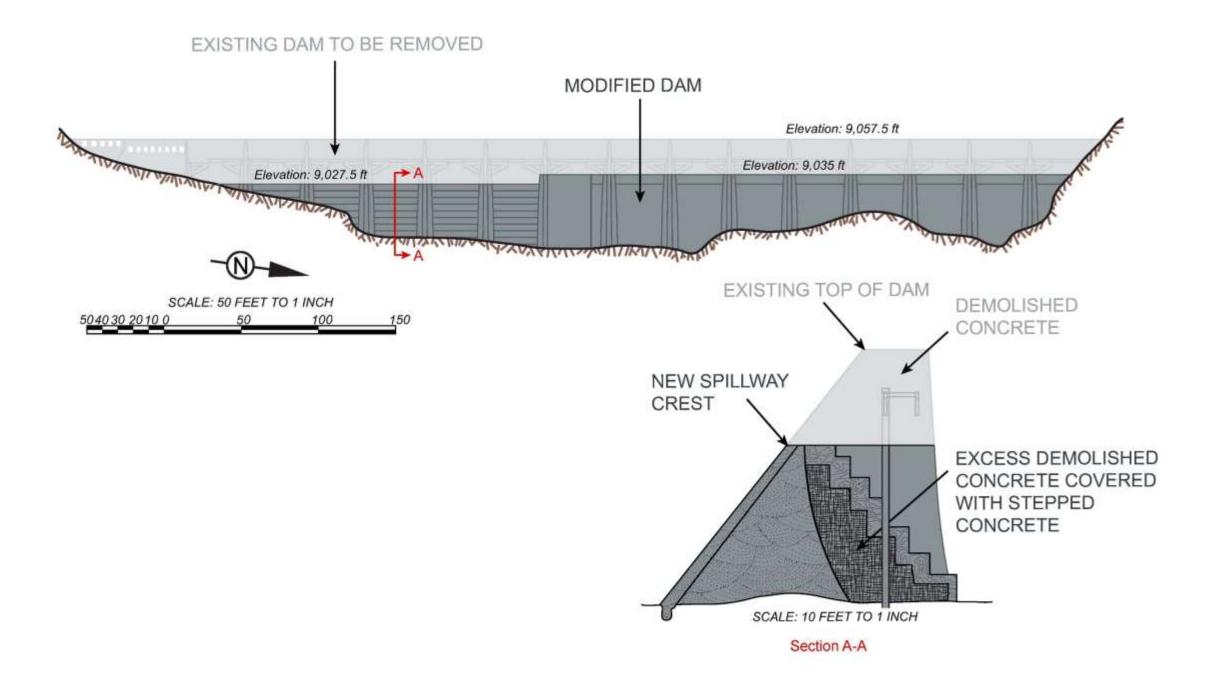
Cross Section of the Existing Gem Dam and Modified Dam Associated with the Gem Dam Retrofitting Alternative
